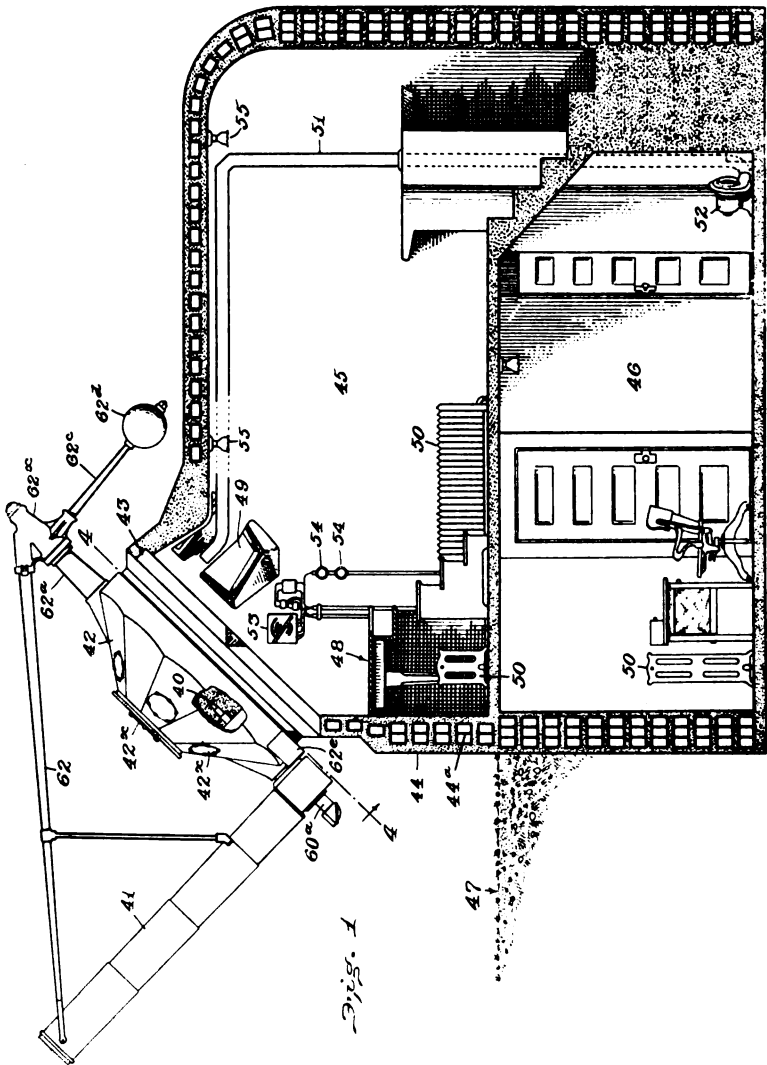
SIDE ELEVATION OF THE TELESCOPE AND DOME AND A LONGITUDINAL VERTICAL SECTION OF THE BUILDING WHICH FORMS THE HOUSE FOR THE OBSERVER
